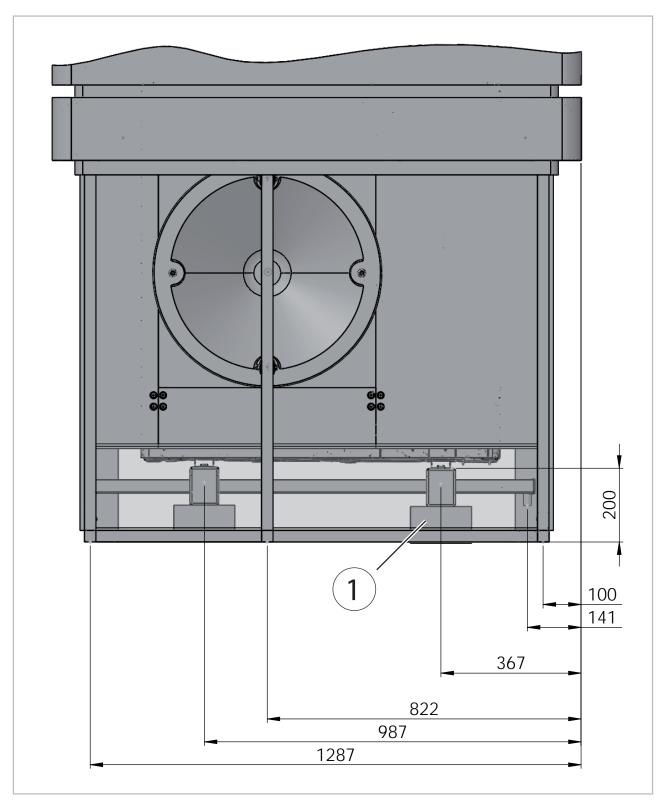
Front view noise protection hood SWK 5 and SWK 7 (all dimensions in mm)
